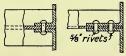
Joint of Bracing Bar and Stanchion.
